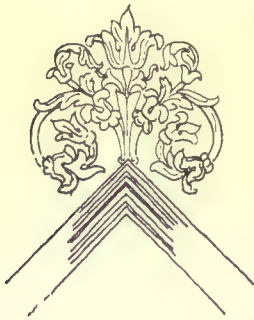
PORTION OF A CEILING, RED LODGE, PARK ROW, BRISTOL.
